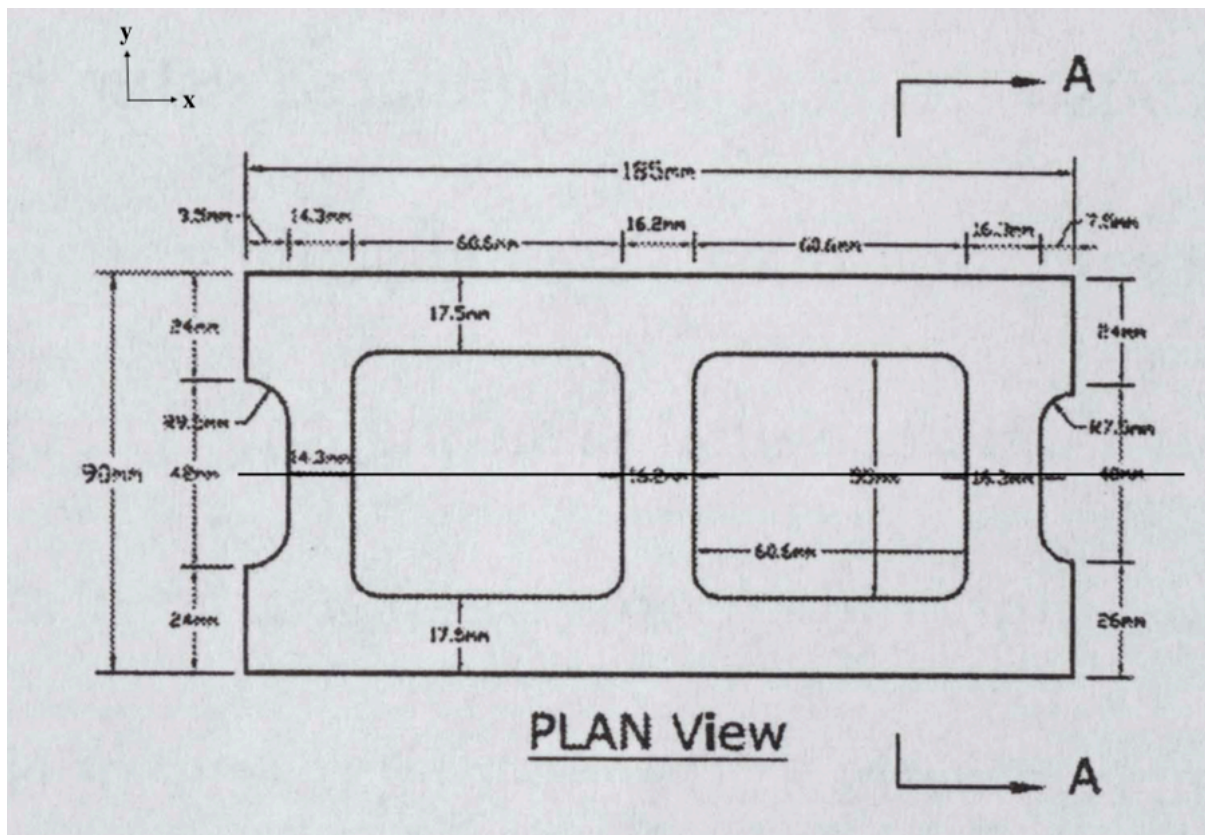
Plan view depicting the dimensions of a typical stretcher concrete masonry block used in the construction of the wall
